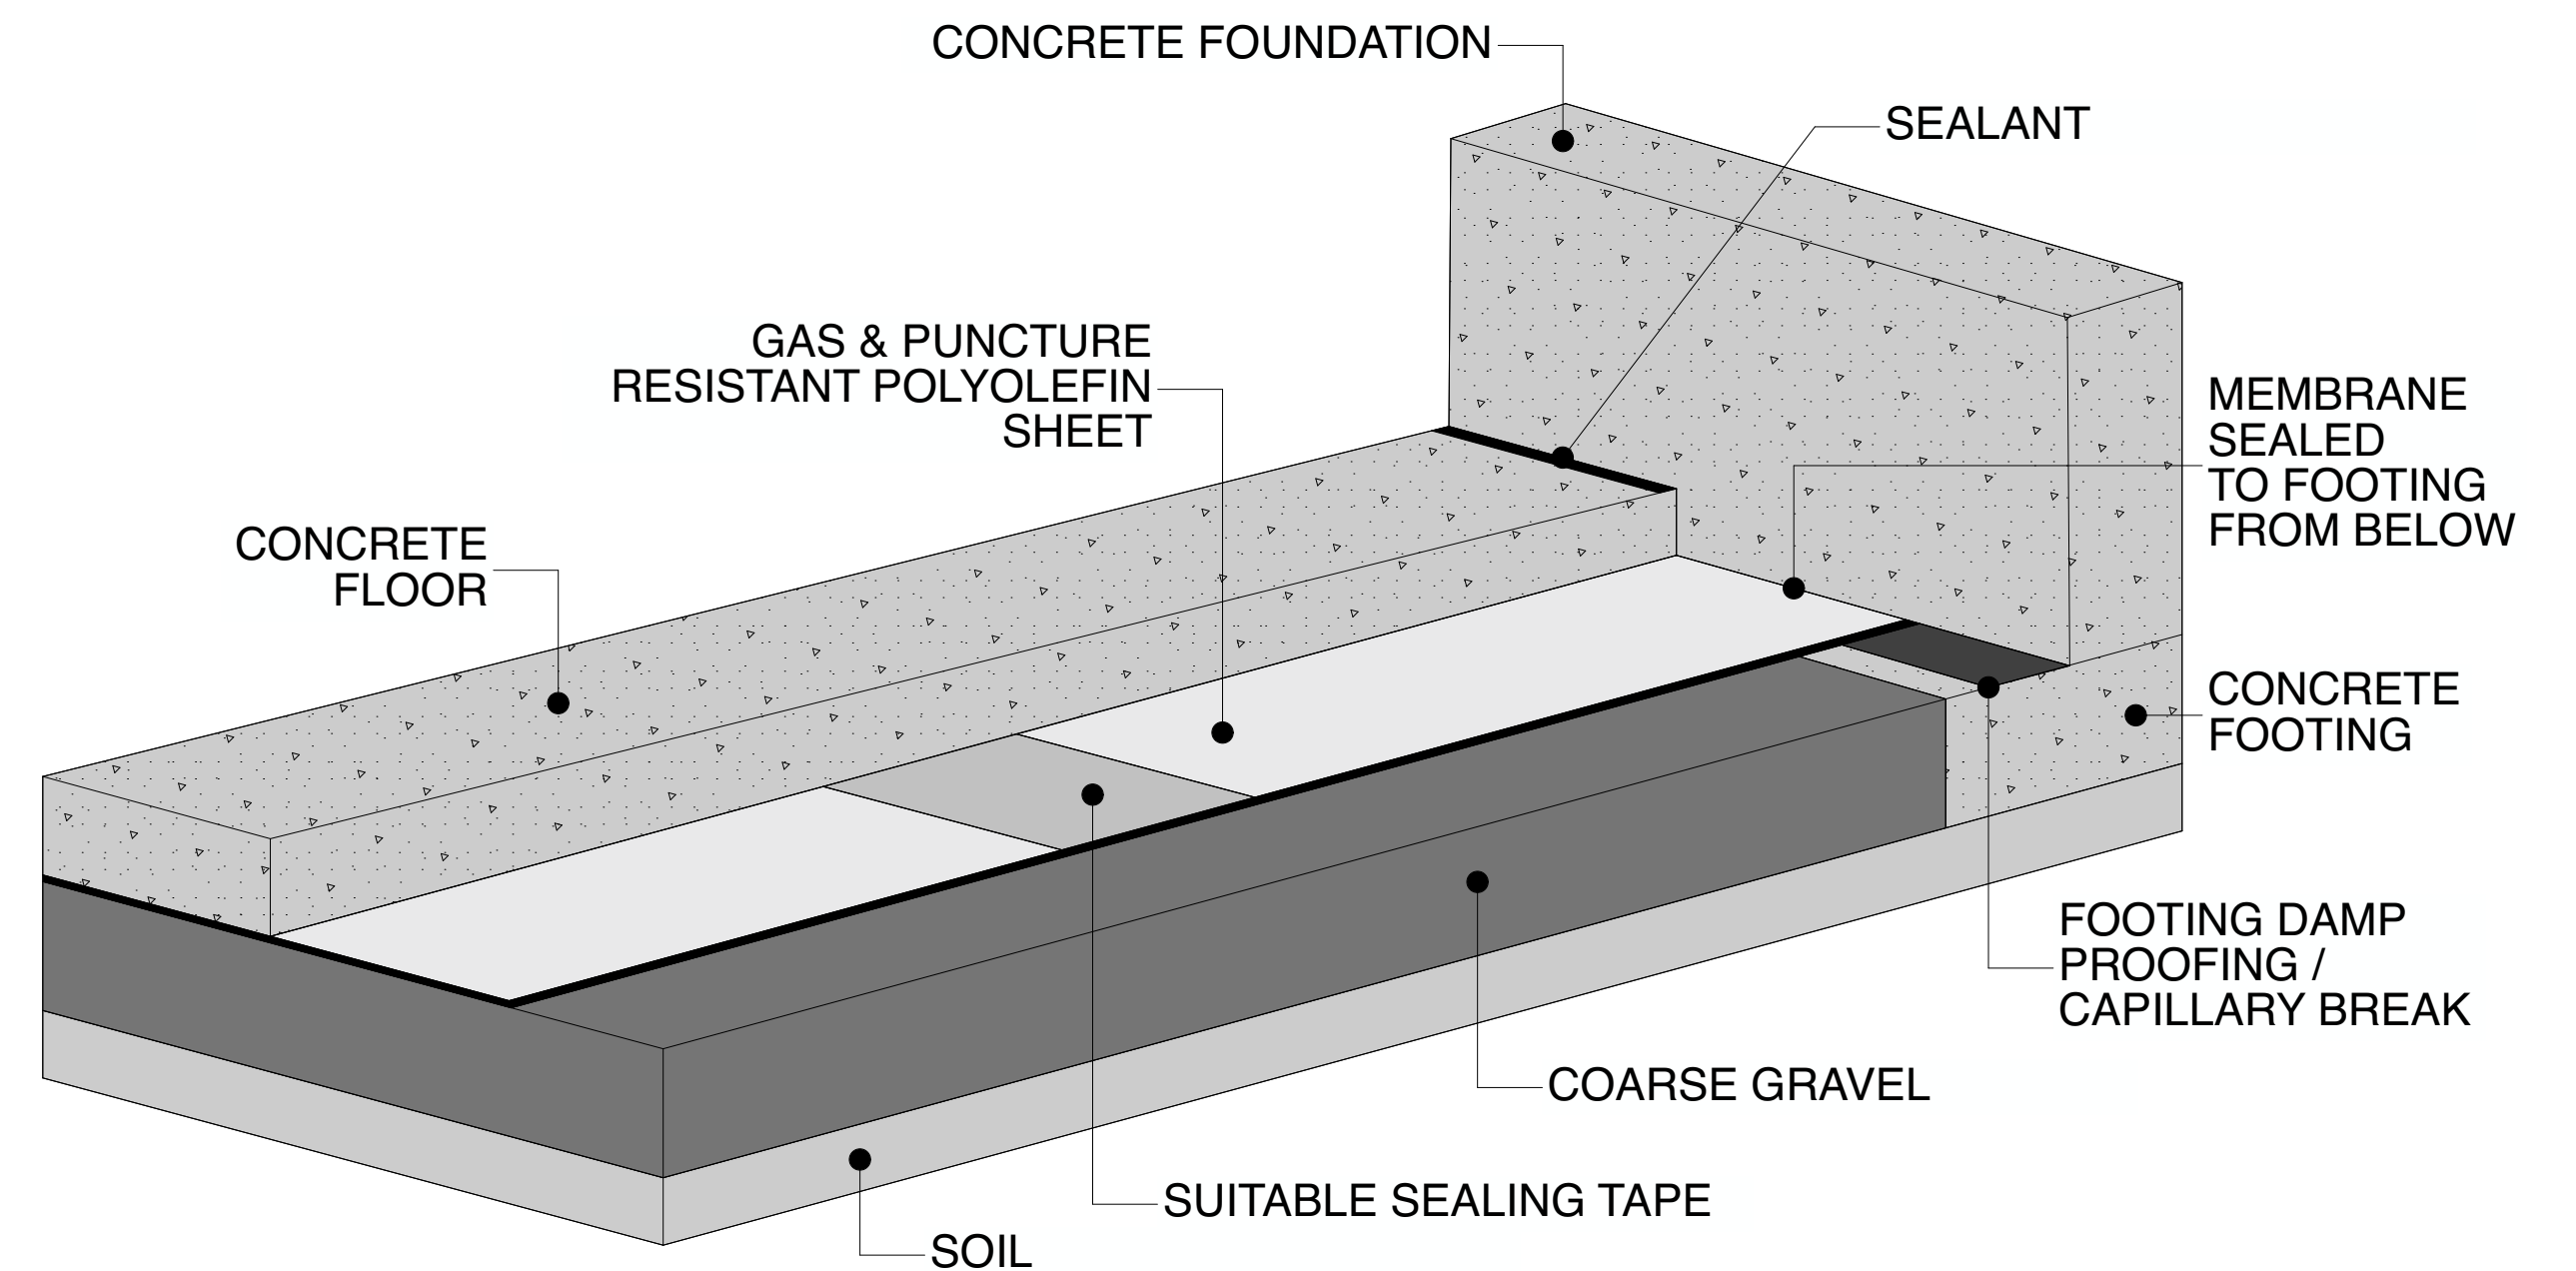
SEALING SUB-SLAB MEMBRANE HORIZONTALLY TO CONCRETE FOOTING PRIOR TO SLAB POUR AND OF THE SLAB/WALL EXPANSION JOINT AFTER THE SLAB POUR
